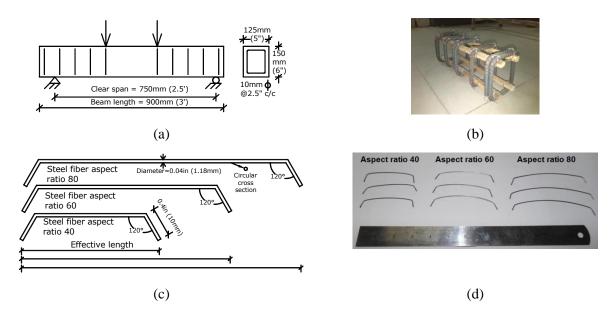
(a) beam detailing, (b) shear reinforcement, (c) and (d) geometry and images of steel fibers. Table 1: Summary of the concrete cylinder specimen
